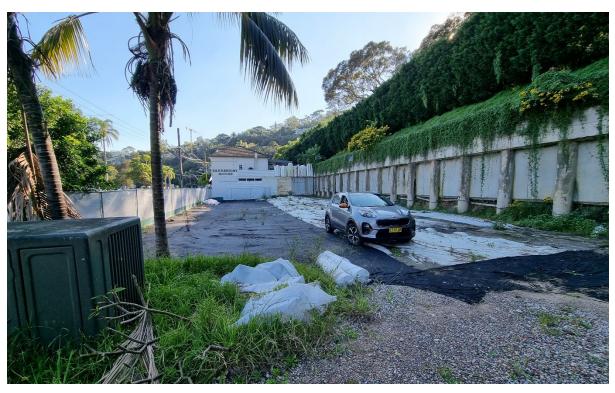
Site layout, facing north. Ground covering and scarp with soldier pile wall evident, as well as electricity kiosk.
